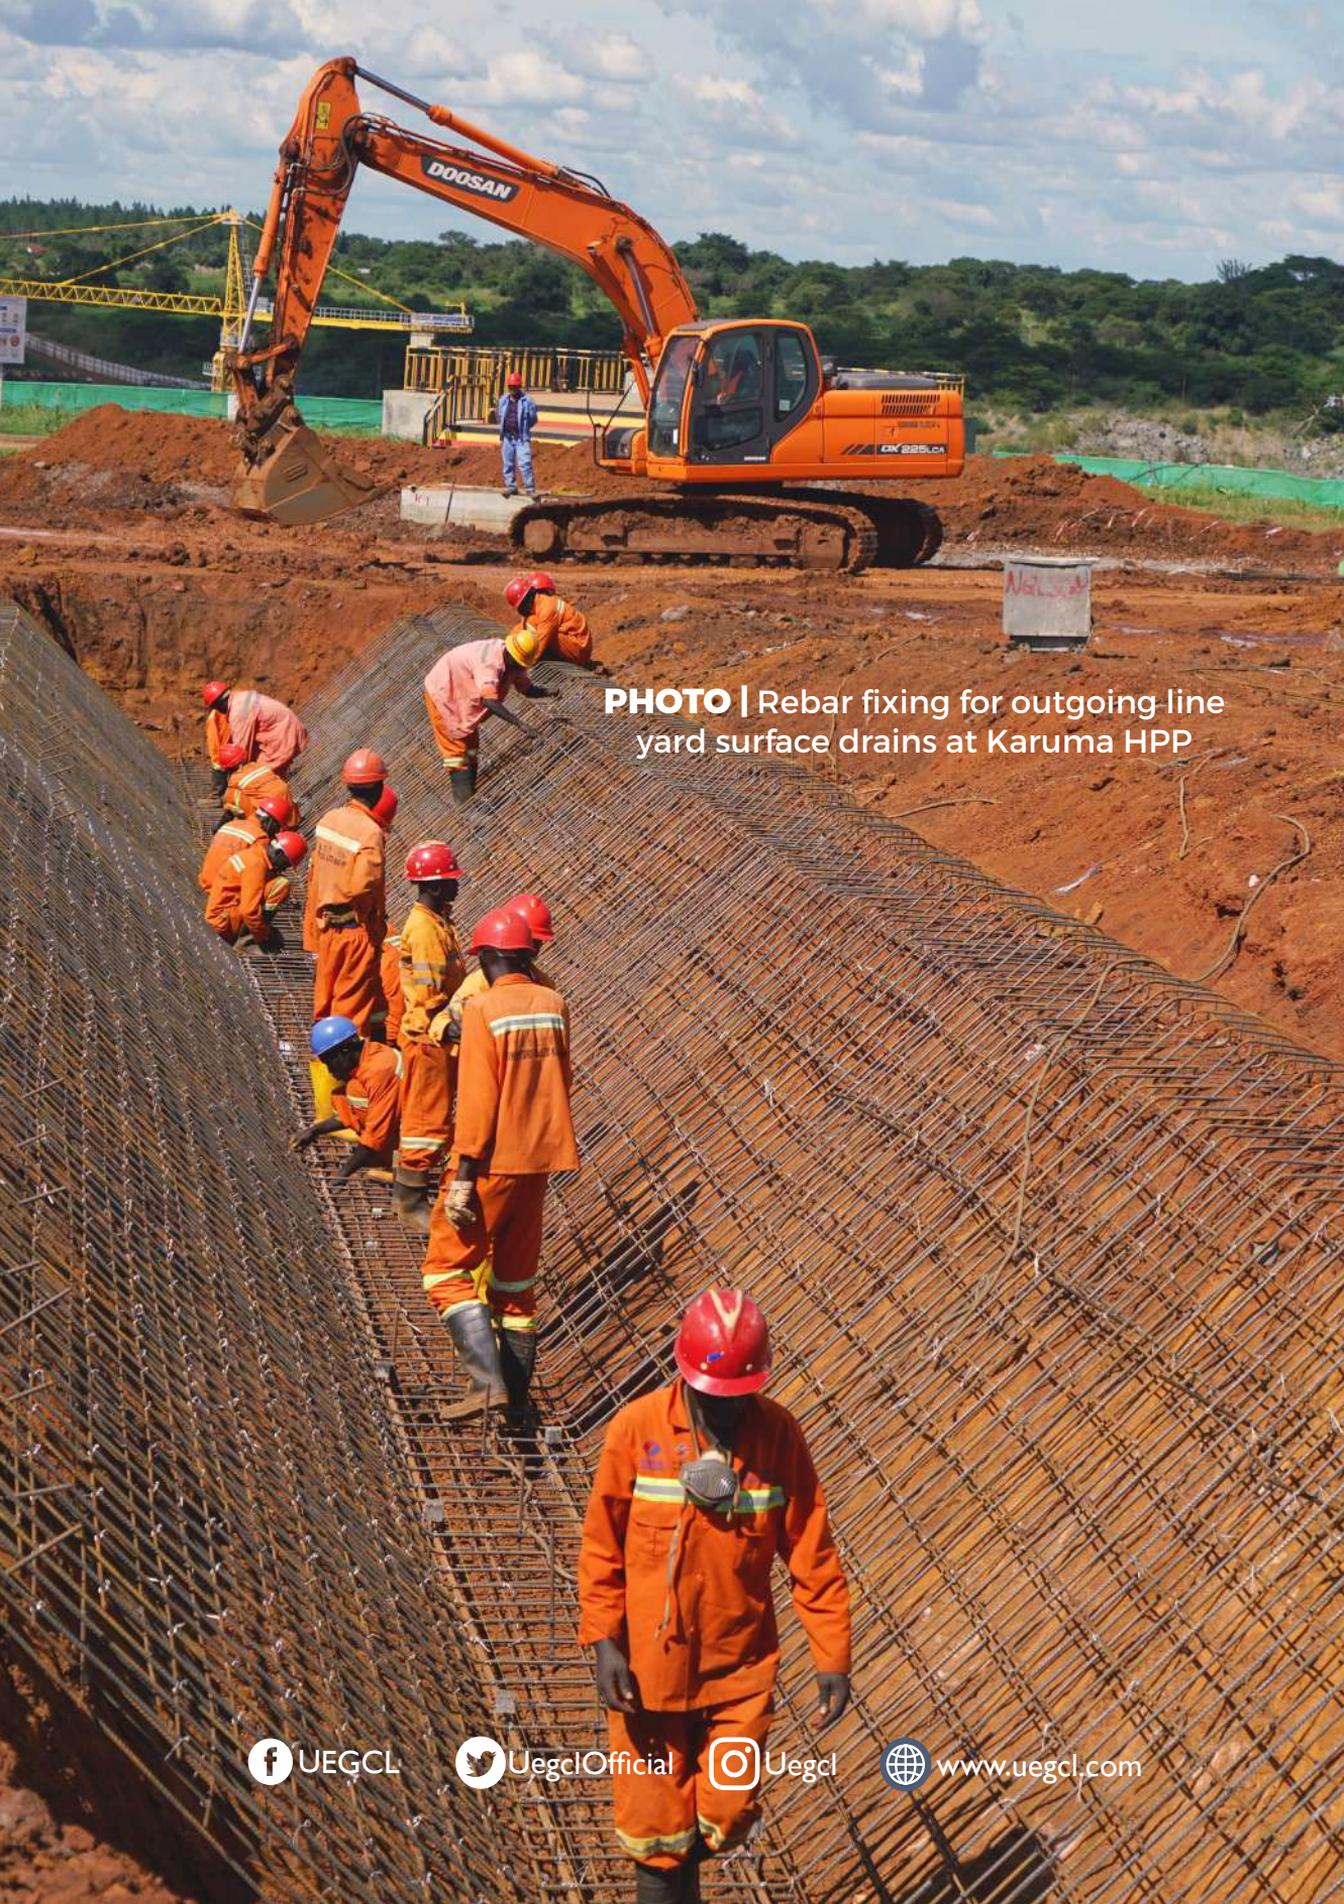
PHOTO | Rebar fixing for outgoing line yard surface drains at Karuma HPP
